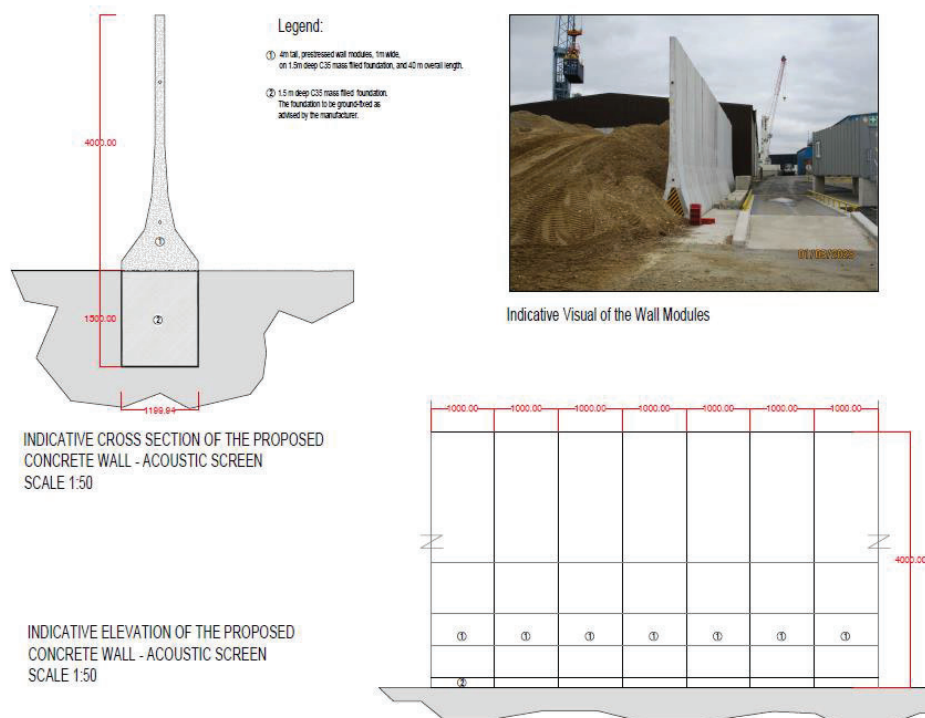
Proposed Elevations (please note – larger version of plan can be found in the Committee Plan Pack)
